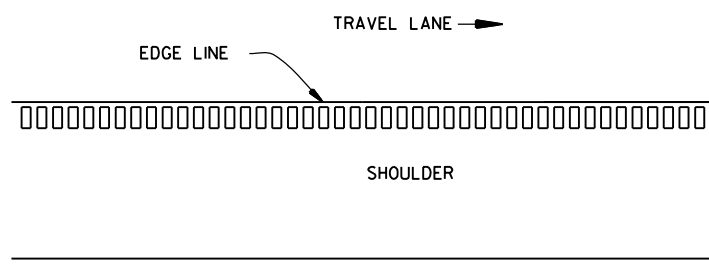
DETAIL FOR RUMBLE STRIP GAP AT DRIVEWAY TURNOUTS
